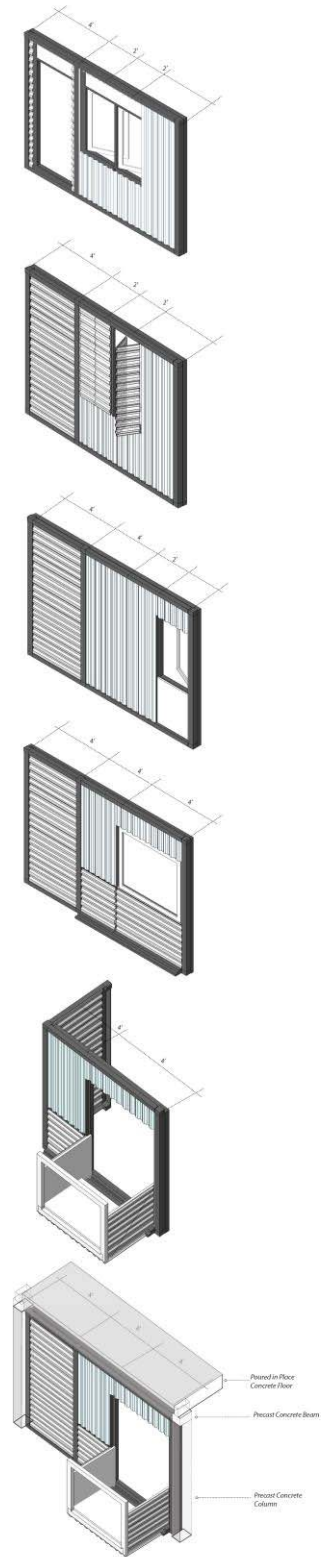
Modular and incremental wall panel composition (Source: Author)
